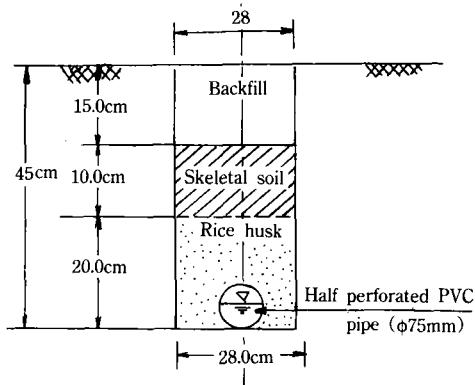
Rice husk surrounds for half perforated PVC pipe drainage
